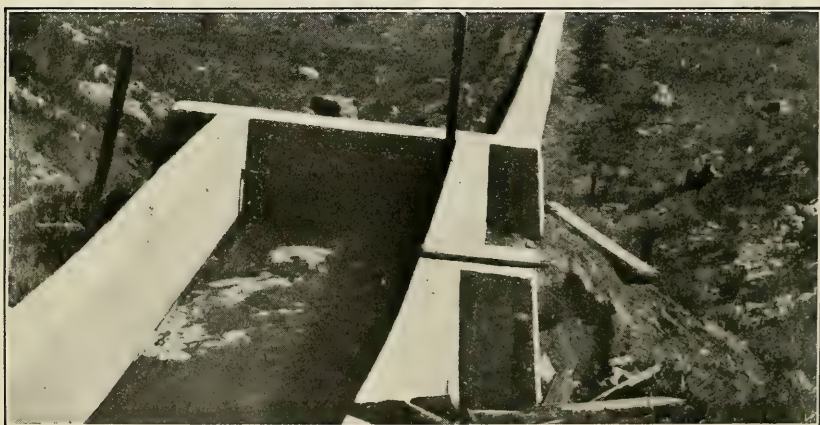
ENTRANCE WELL SUBMERGED, REDUCING AMOUNT OF AIR CARRIED INTO PIPE.
